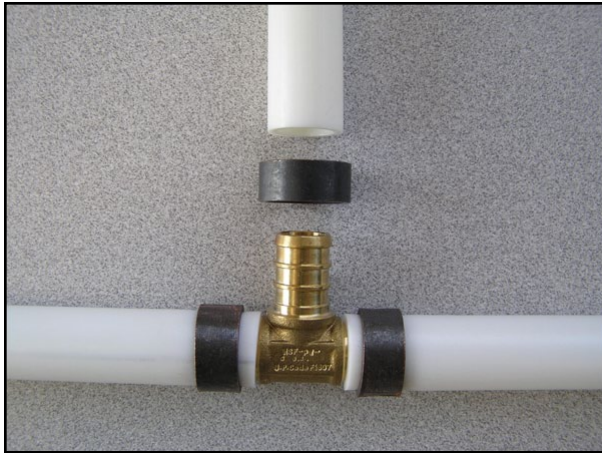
Metal Insert Fitting with Copper Crimp Ring
